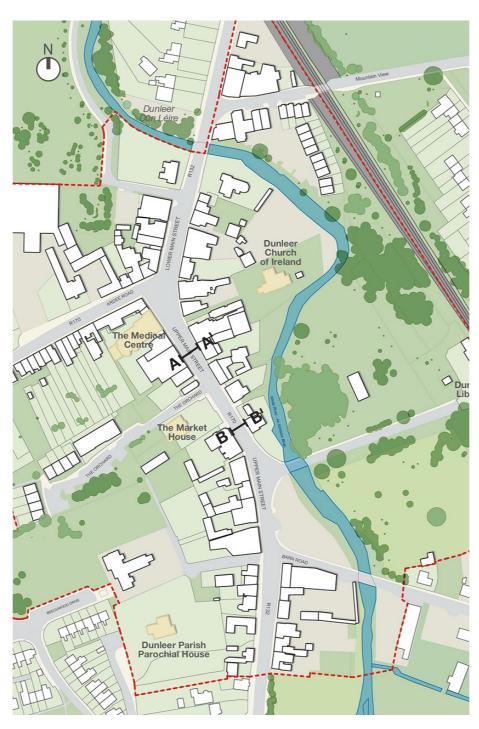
Plan of existing layout of streets and roads in the town centre, and location of sections AA' and BB'
